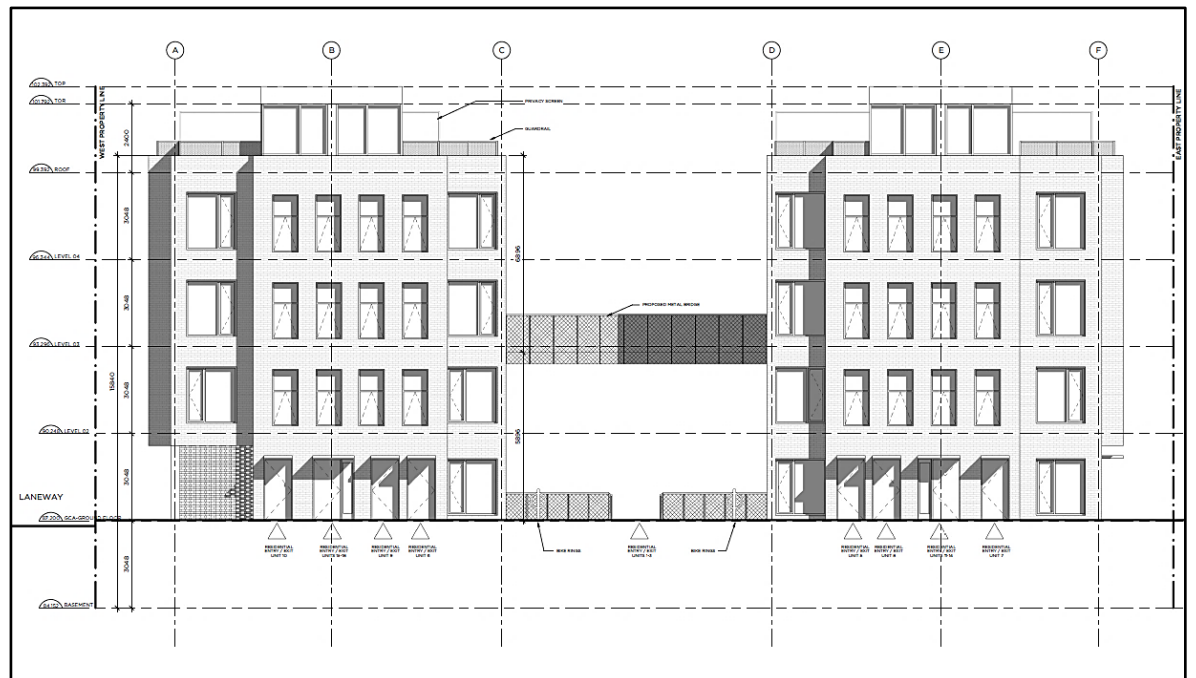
Excerpt of Proposed Southerly Elevations, Facing Kelly Street
